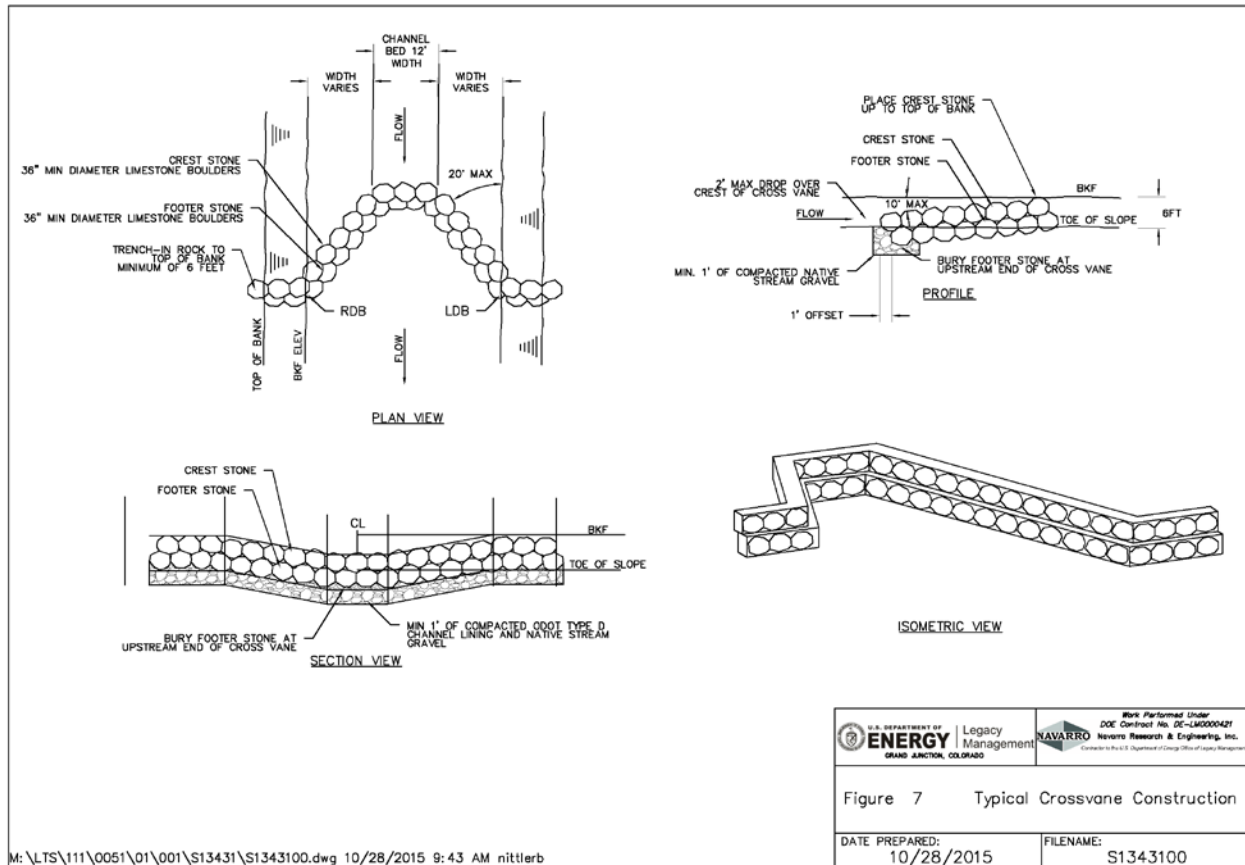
Typical cross-vane construction at Paddys Run project [6]
